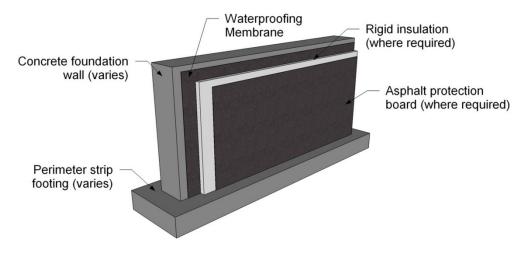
Typical Components of Perimeter Footings and Foundation Walls
